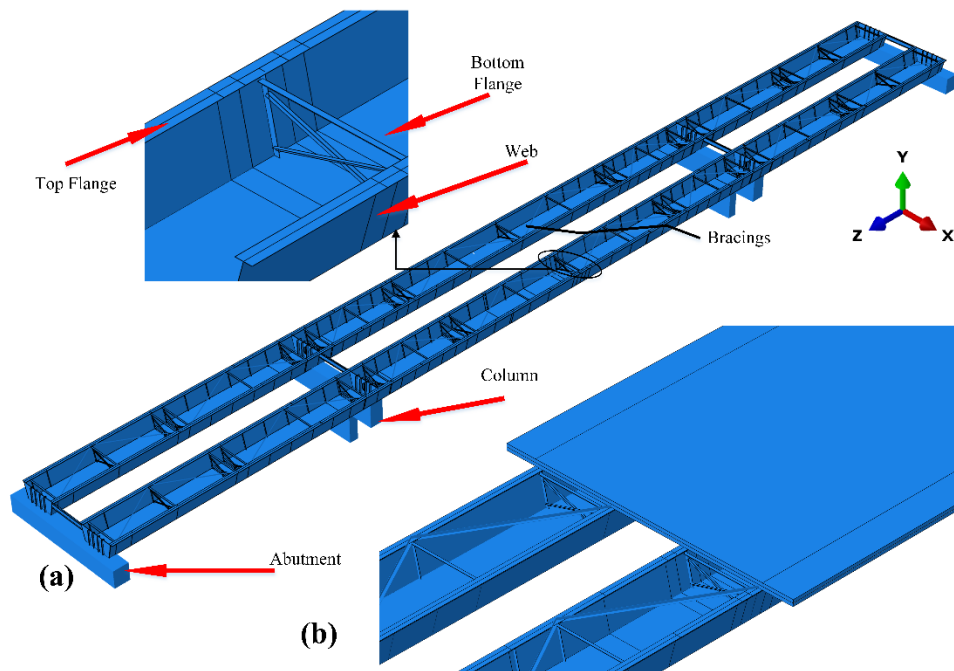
Bridge geometry: (a) entire bridge geometry, and (b) zoomed-in view of deck, girders, and bracings
